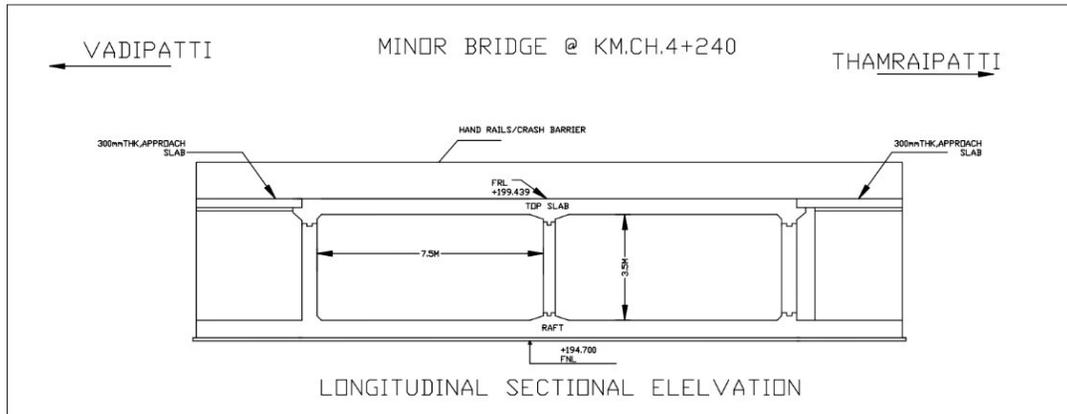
Longitudinal Section of MINOR BRIDGE @ Km.4+240
